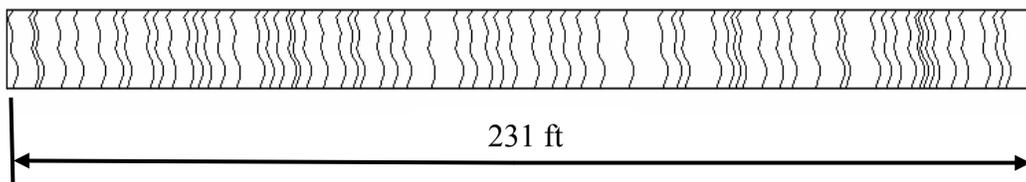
Layout of Cracks along Section 3—SnF1-4
